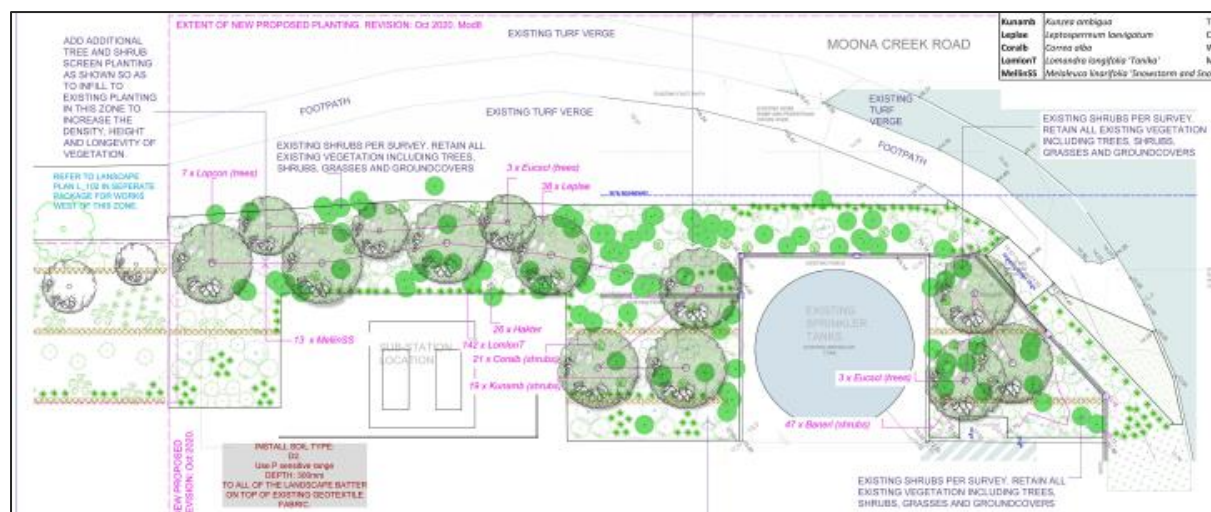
| Proposed infill landscaping (Source: Mod 8 submission documents)
